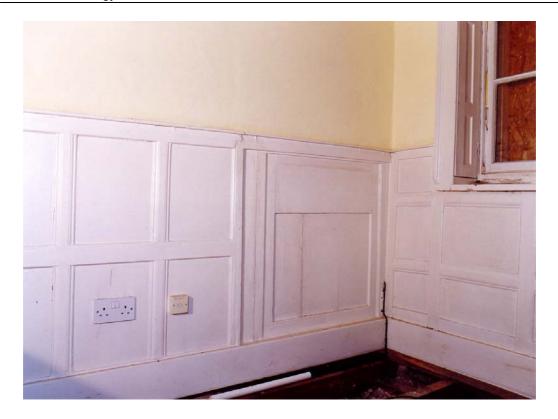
Ground floor, room G2, dado panelling in northwest corner
